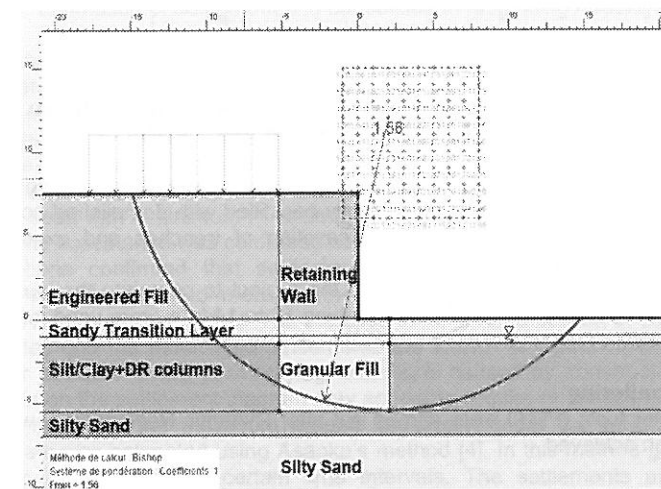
Stability analysis of MSE Wall on pre-excavated DR trench
